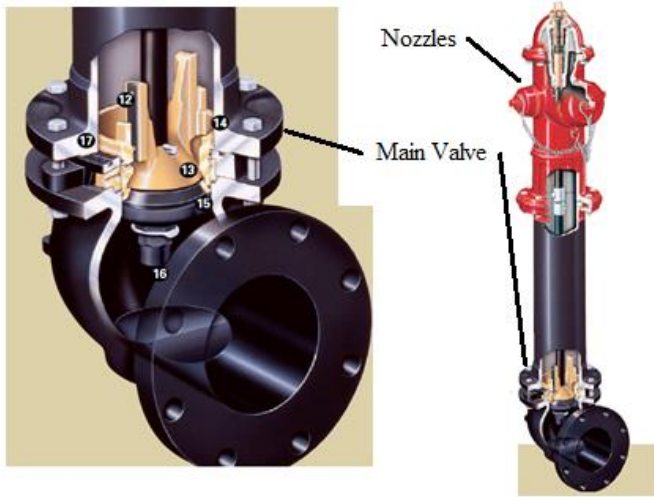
Fire Hydrant Installation with a Riser and an Underground Main Valve
